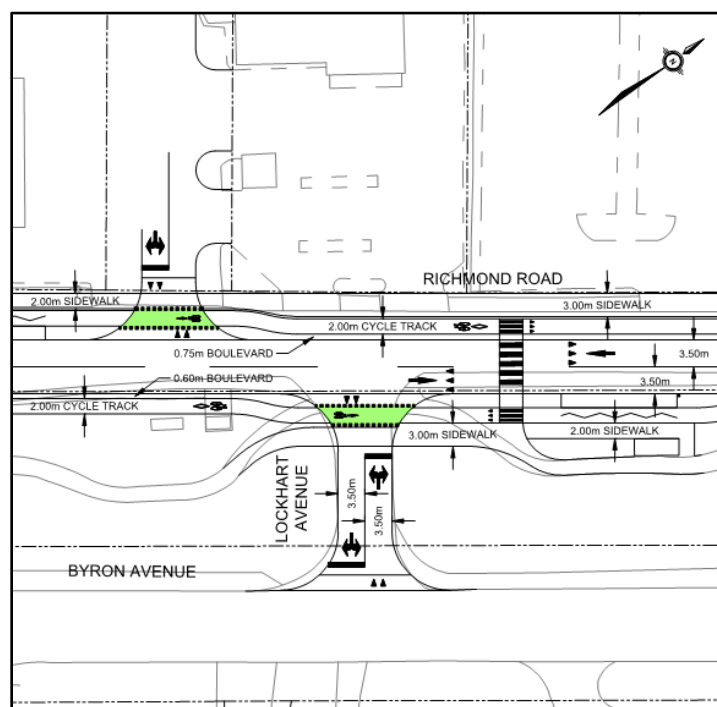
Richmond Road Complete Streets - Lockhart Avenue
